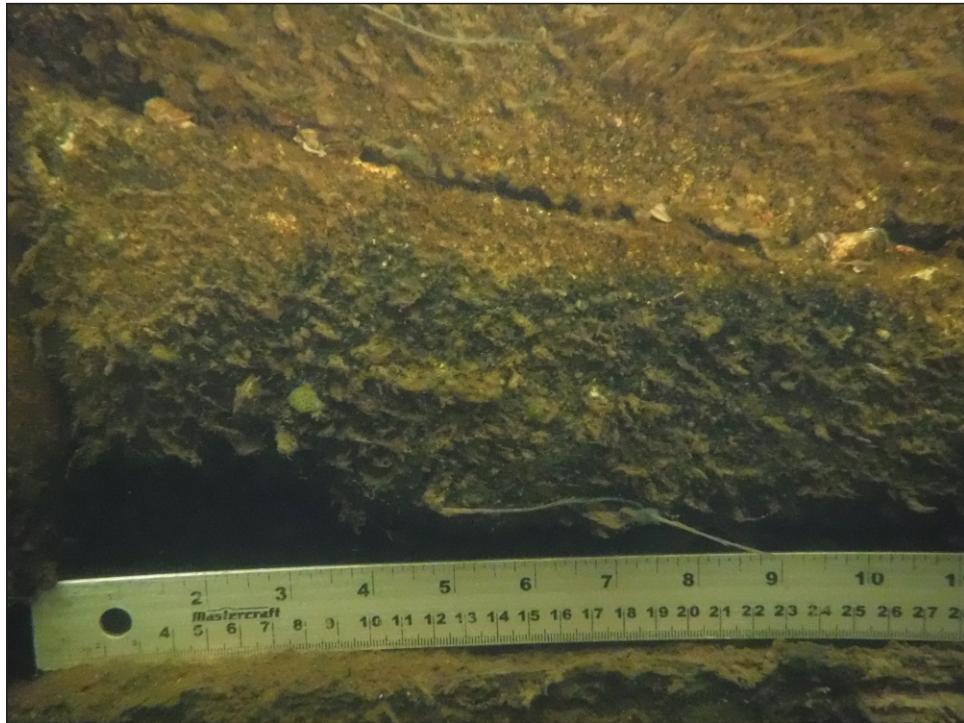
Crack in concrete, west side of Rest Pier
